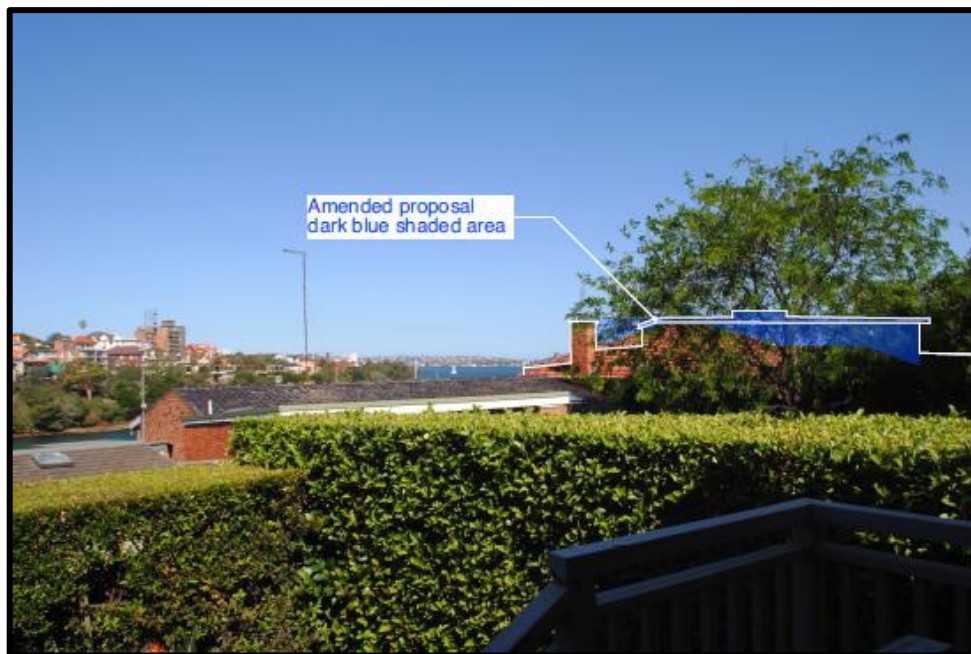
Proposed View (location 4) from 176 Kurraba Rd, Kurraba Point (Source: Applicant)
